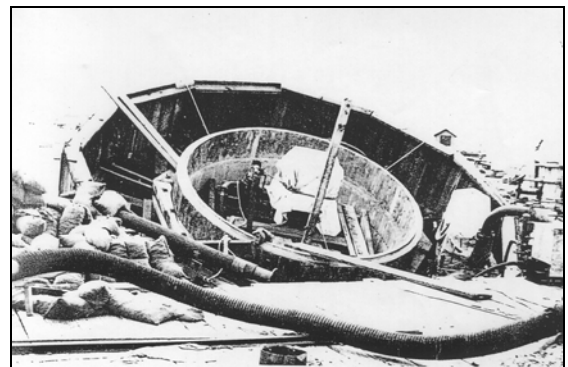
The construction of The Station M Caisson at the Fisherman's Pier (Photo: Lewis Ferrier Collection)
